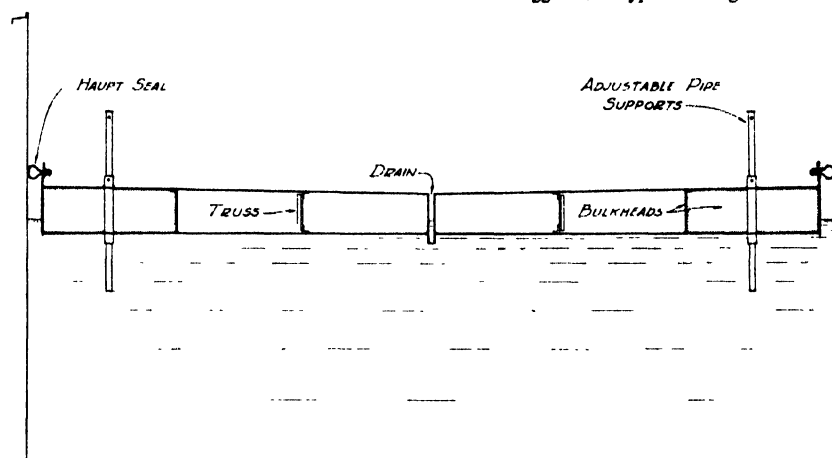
Double-deck Pontoon Roof with Haupt Seal.
